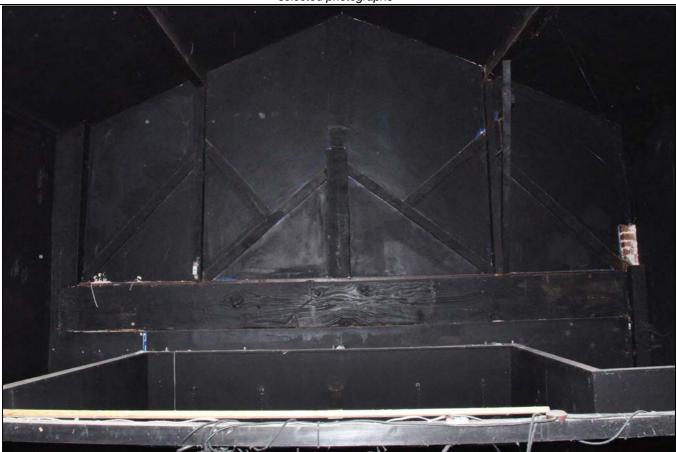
First floor: roof truss forming division between Club Room and Dutton Street dwelling, looking south-east
